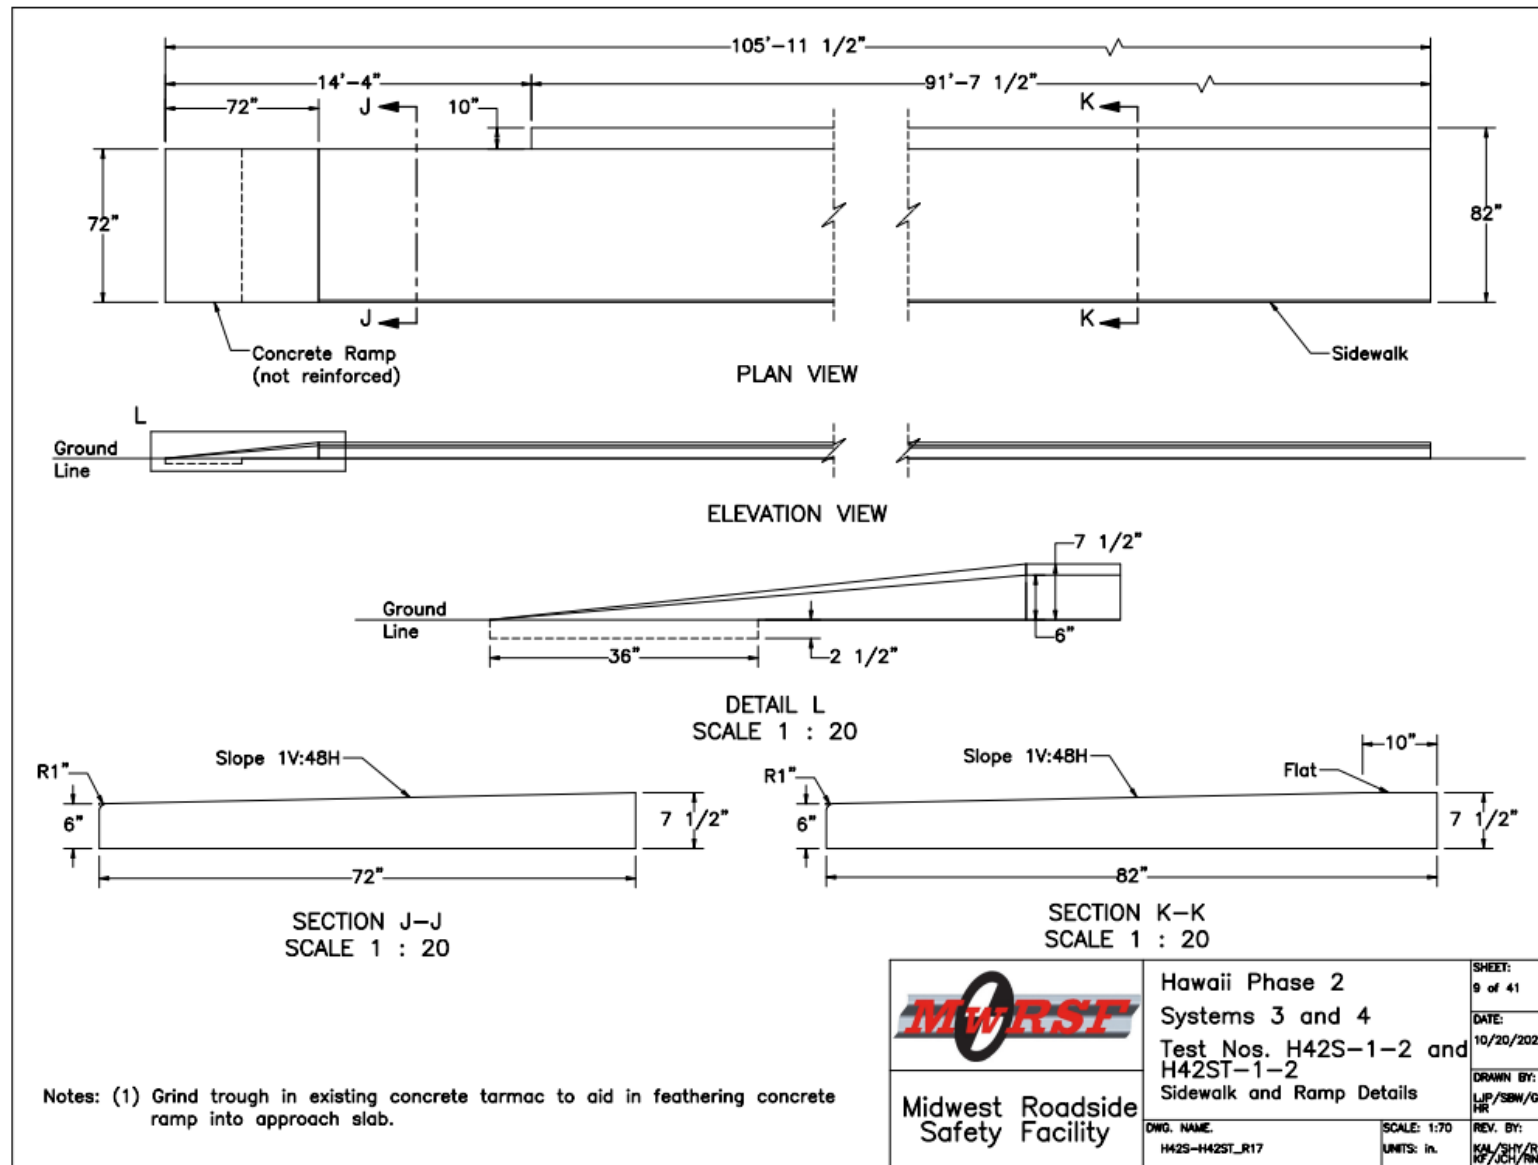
Sidewalk and Ramp Details, Test Nos. H42ST-1 and H42ST-2
